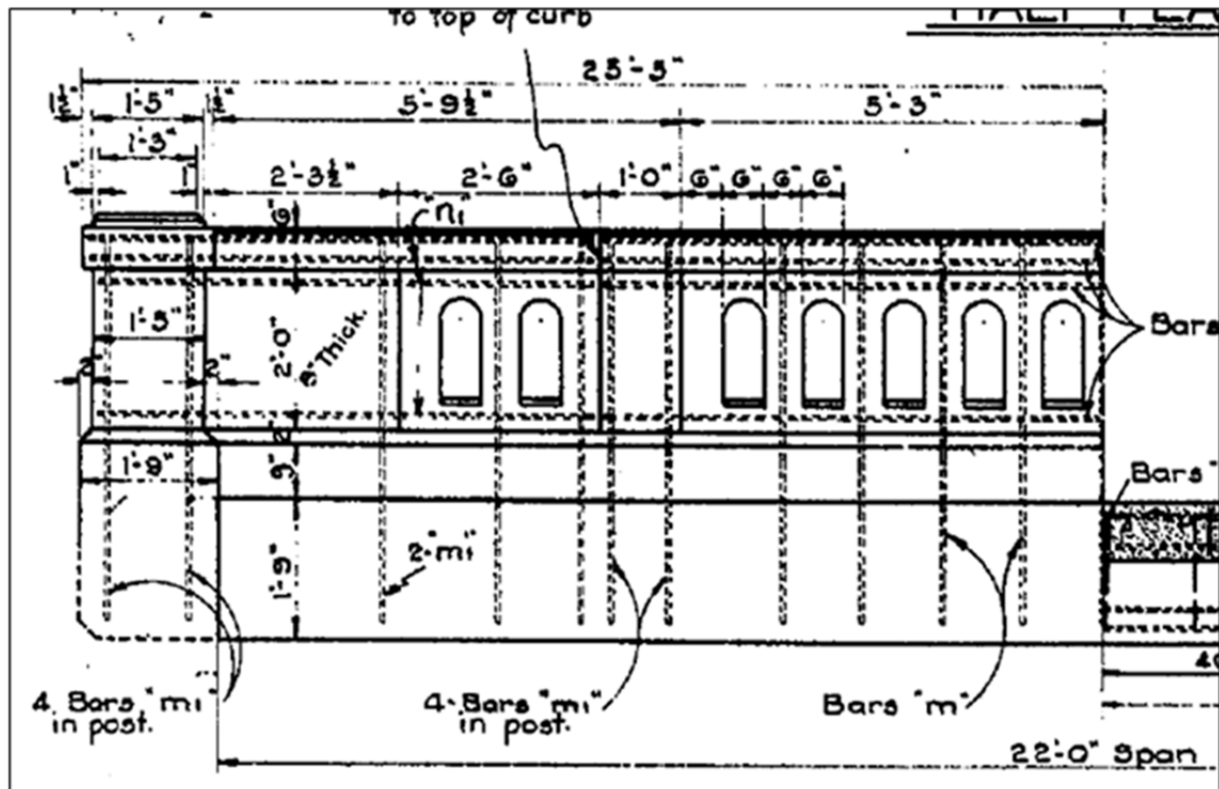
Elevation View of Concrete Post and Beam Railing with Concrete Pickets
